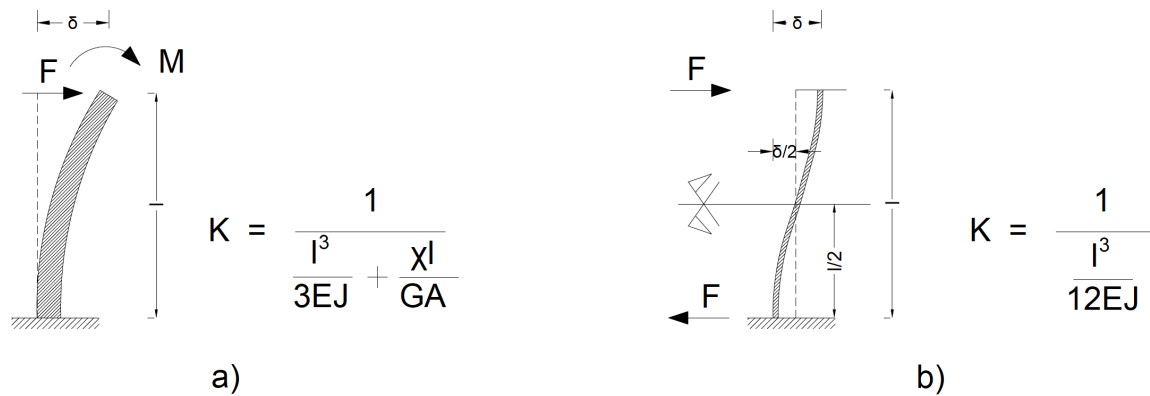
Typical equivalent beam models: a) flexural cantilever beam and b) pure shear-type cantilever beam
